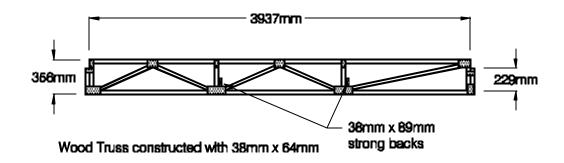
Construction of 356 mm deep wood trusses using 38 x 64 mm lumber
